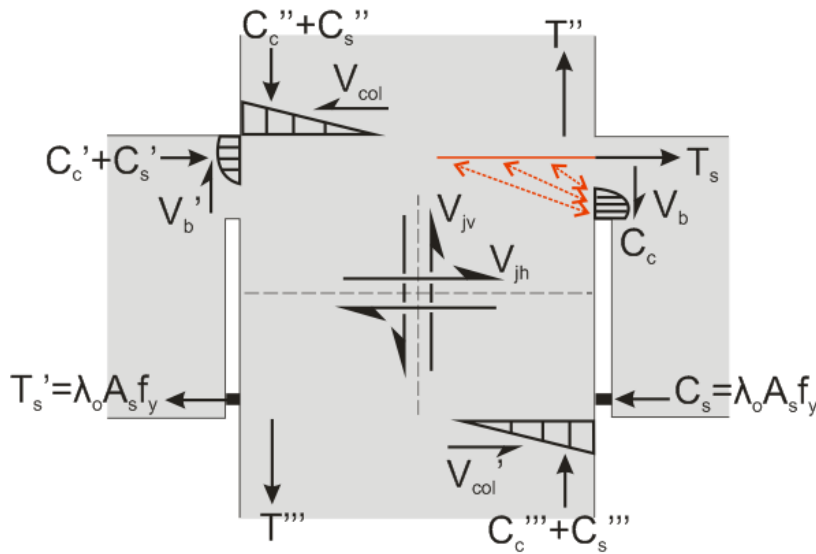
External actions on an interior slotted beam joint (Au, 2010)
